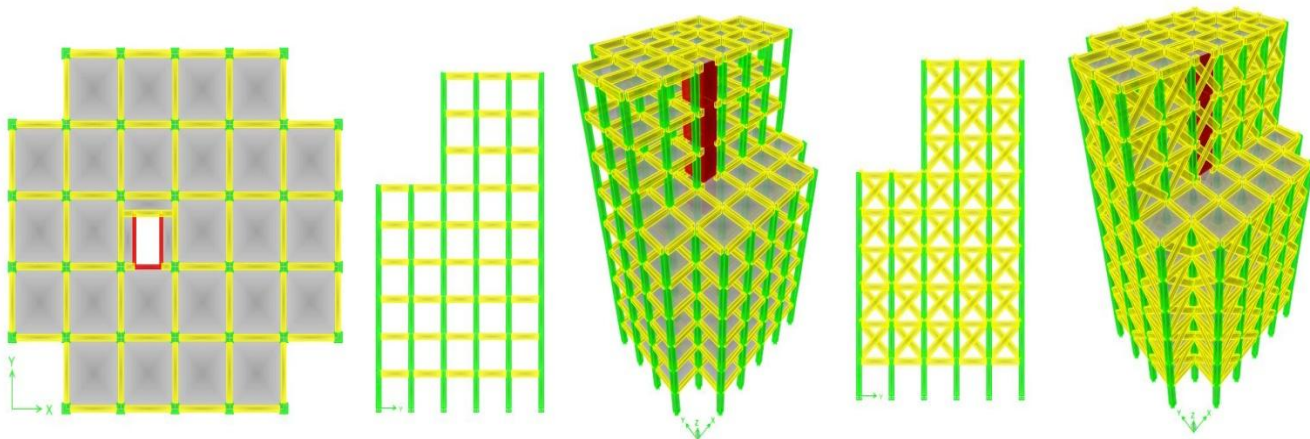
Plan, Elevation and 3D view of bare and infill frame for model-7 and model-8 respectively.
